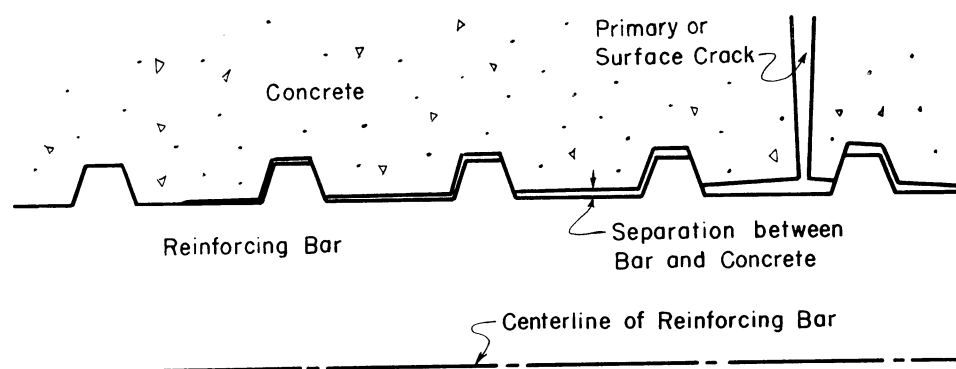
Section through reinforcing bar and concrete showing separation that occurs near a primary crack
